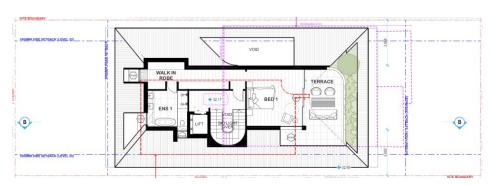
Approved second floor plan under DA/436/2022 - 61 The Corso, Maroubra (Source: PopovBass)
